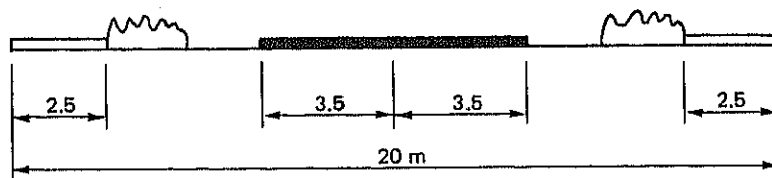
Temporary Local Road Section (Urgent Plan)
